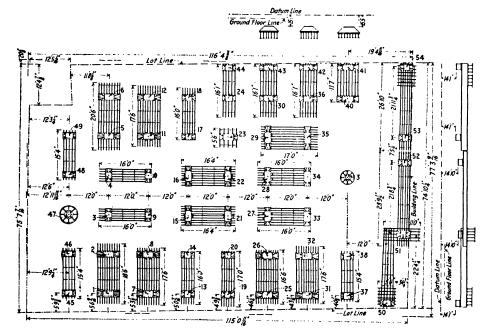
FOUNDATION PLAN OF SINGER BUILDING.
